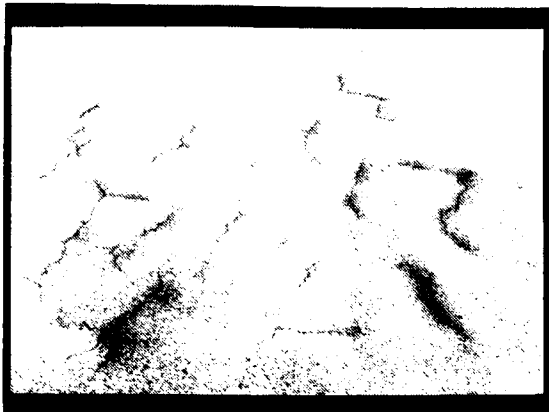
AC depression which will eventually progress to alligator cracking and pavement failure under aircraft loads.
